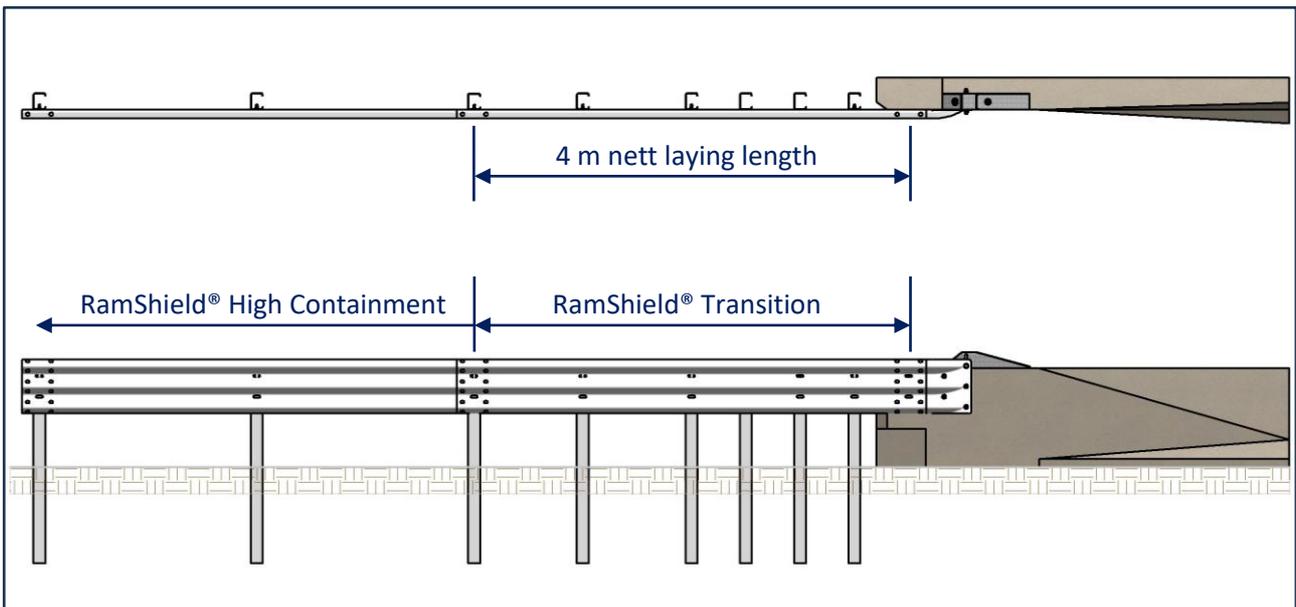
RamShield® Transition, Connection to RamShield High Containment.
